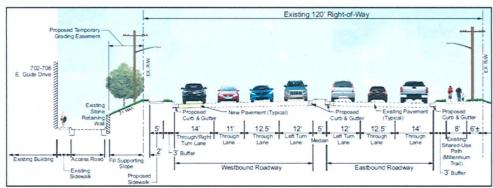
Alternative 2: Master Plan. Proposed typical roadway along East Gude Drive at Section B-B, approximately 2000' east of Calhoun Drive.
